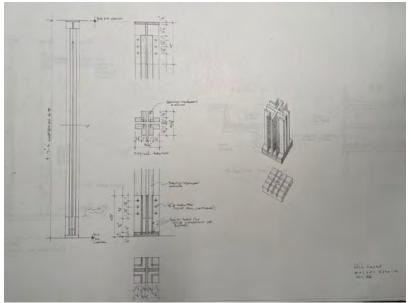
Drawing showing a proposed column detail (Shim Sutcliffe Architects Inc. Craven Road House, Volume 1, project book with bound collections of plans and sketches.)
